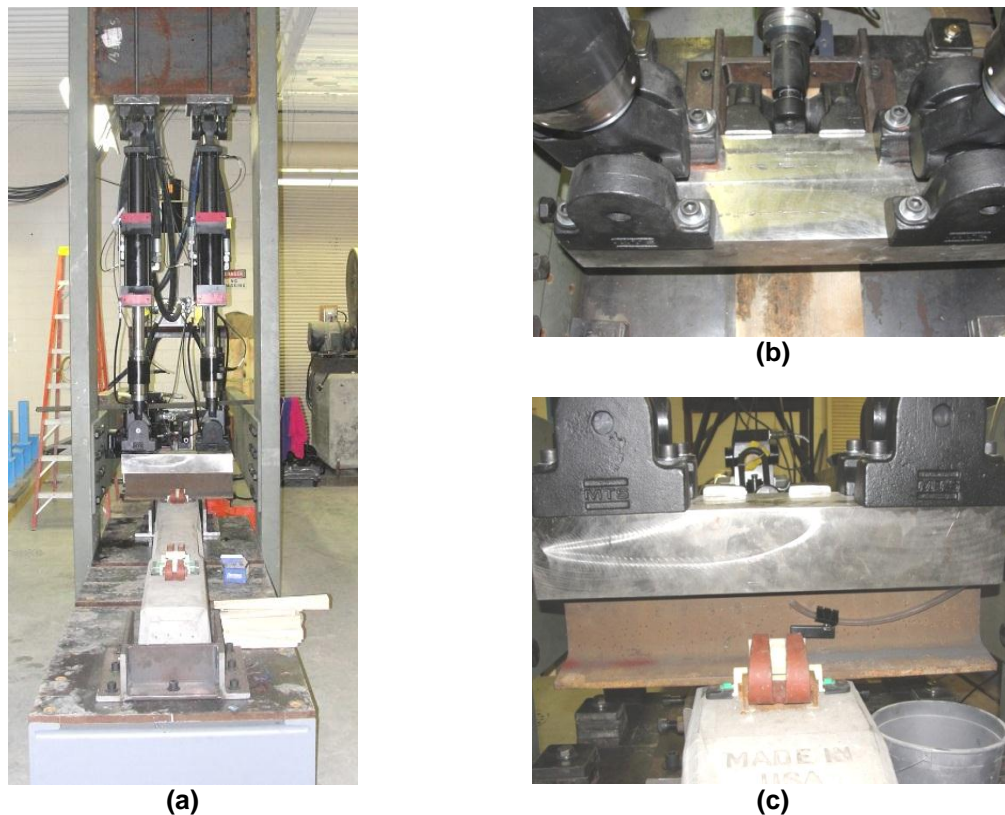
(a) Full scale concrete sleeper and fastening system testing at UIUC, (b) Vertical and lateral actuators connected to the loading head, (c) The loading head at rest of the head of the rail, with the fastening system applied
